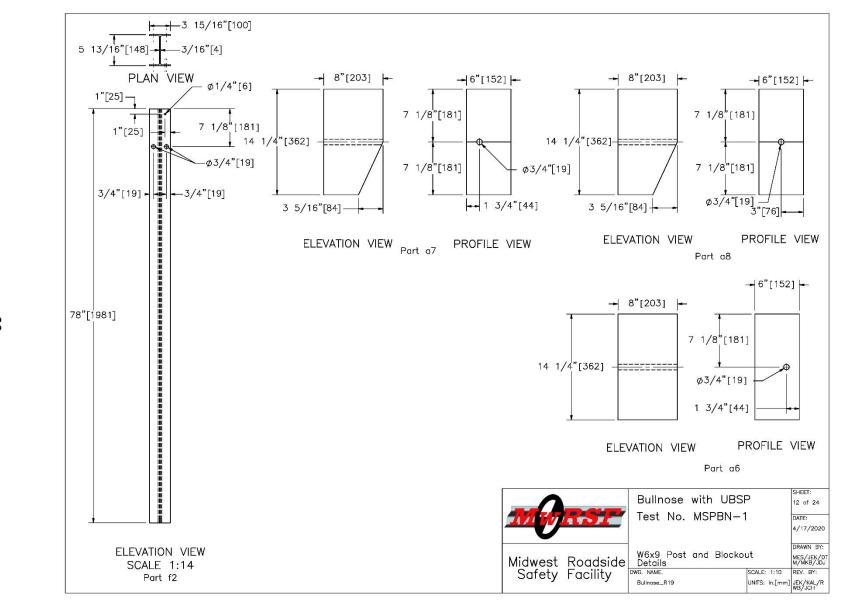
W6x9 Post and Blockout Details, Test Nos. MSPBN-1 through MSPBN-3
